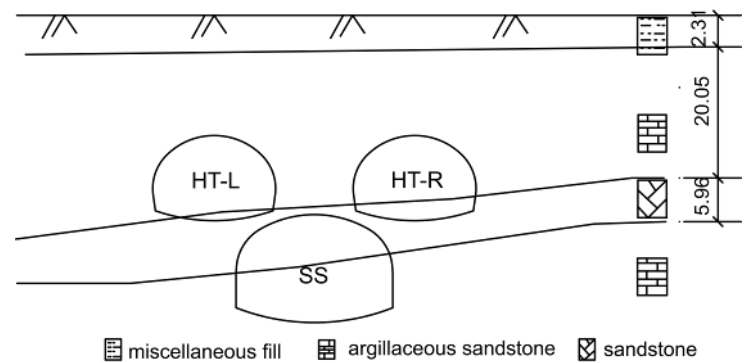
Cross-sectional layout of the tunnels (unit: m)
